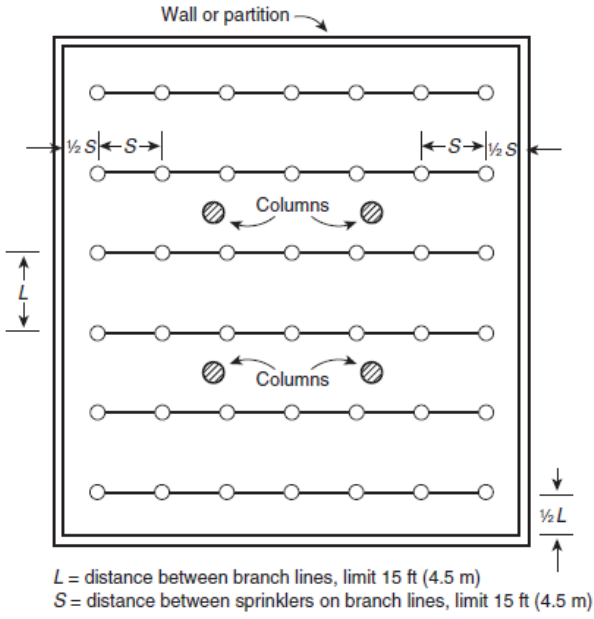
Positioning of Standard Spray Sprinklers Under Flat Slab Concrete Ceiling in Ordinary Hazard Occupancy.
